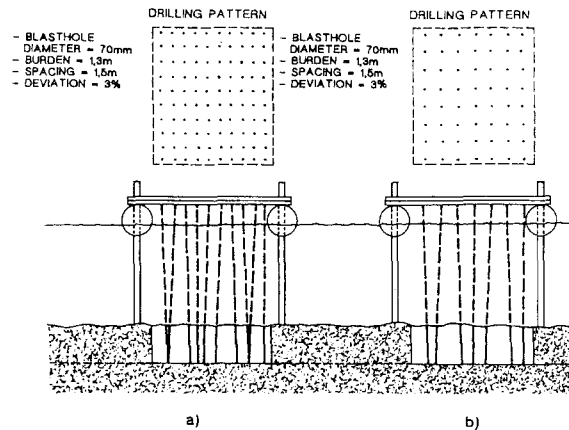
Manual charging (a) Mechanized charging (b).
